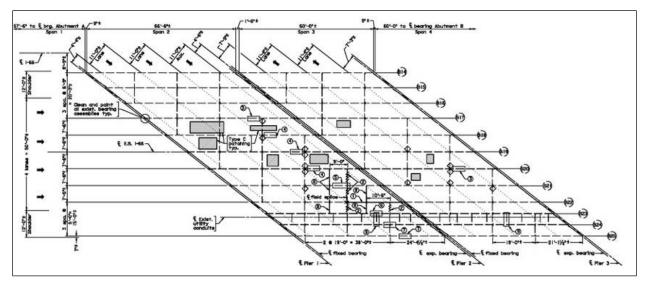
I-66 EB, Spans 2 and 3, Collision Damage Location Plan
